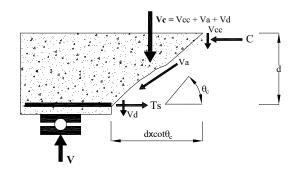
Forces at a diagonal crack in a beam without web reinforcement
